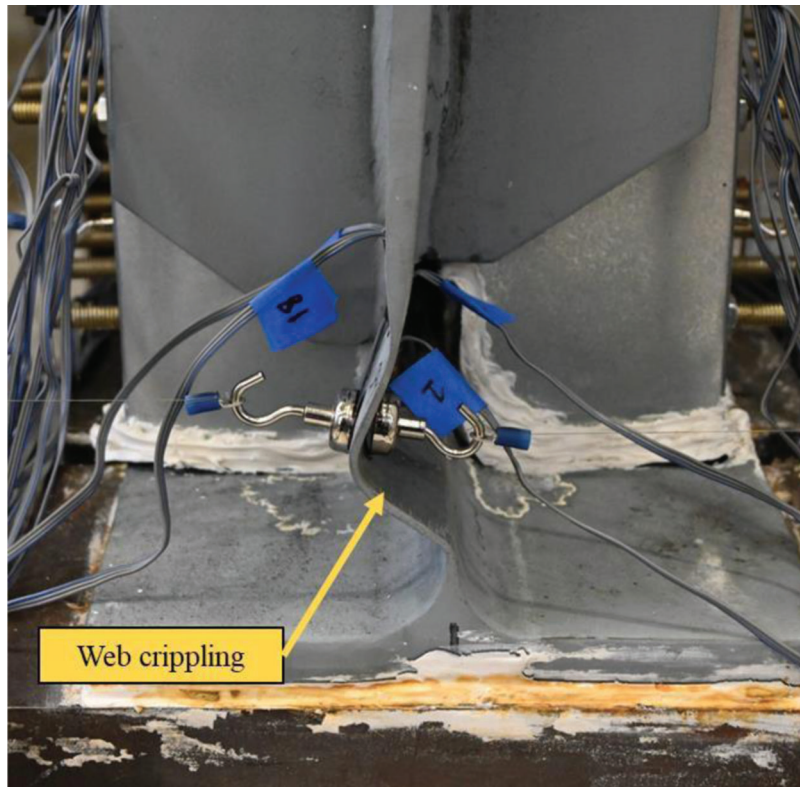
Specimen 4: deformed shape, enlarged view.
